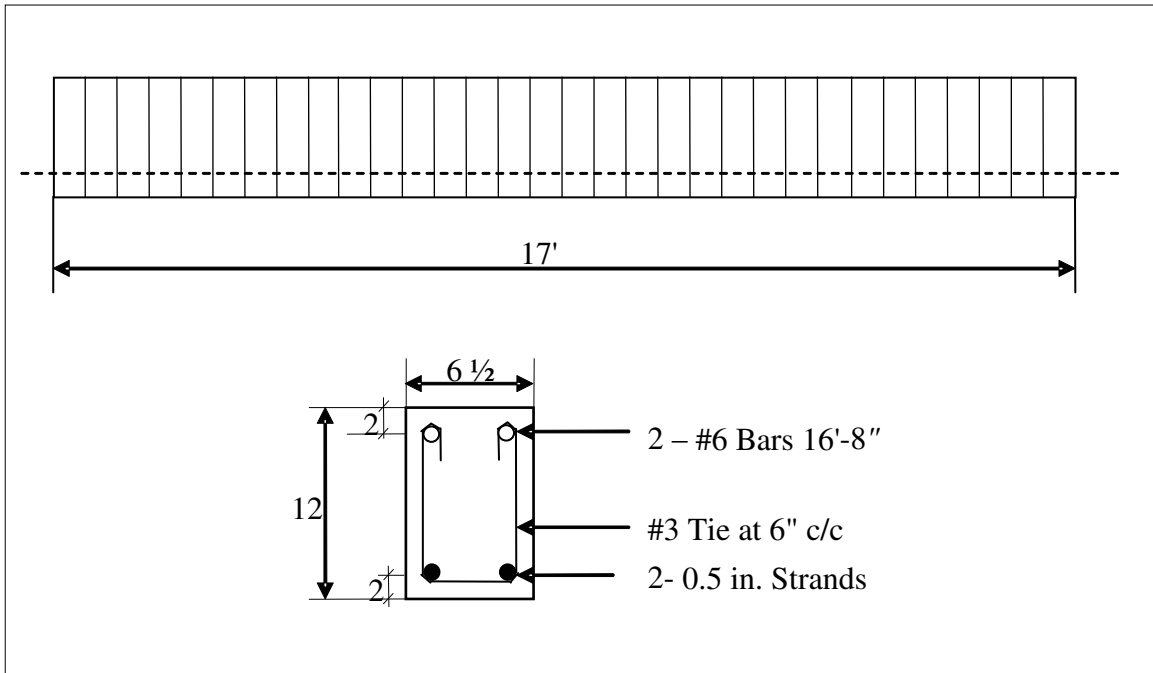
Cross-section and reinforcement details of rectangular beams (Chandran 2006)
